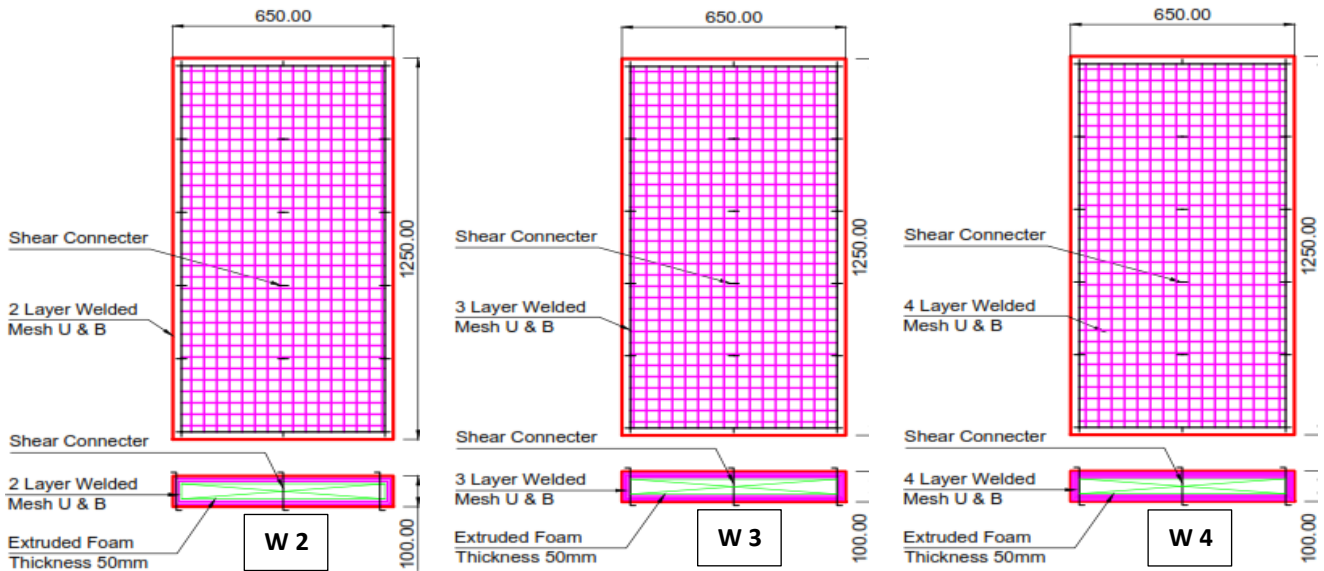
Reinforcement details of Group-1 walls (W2, W3 and W4).
